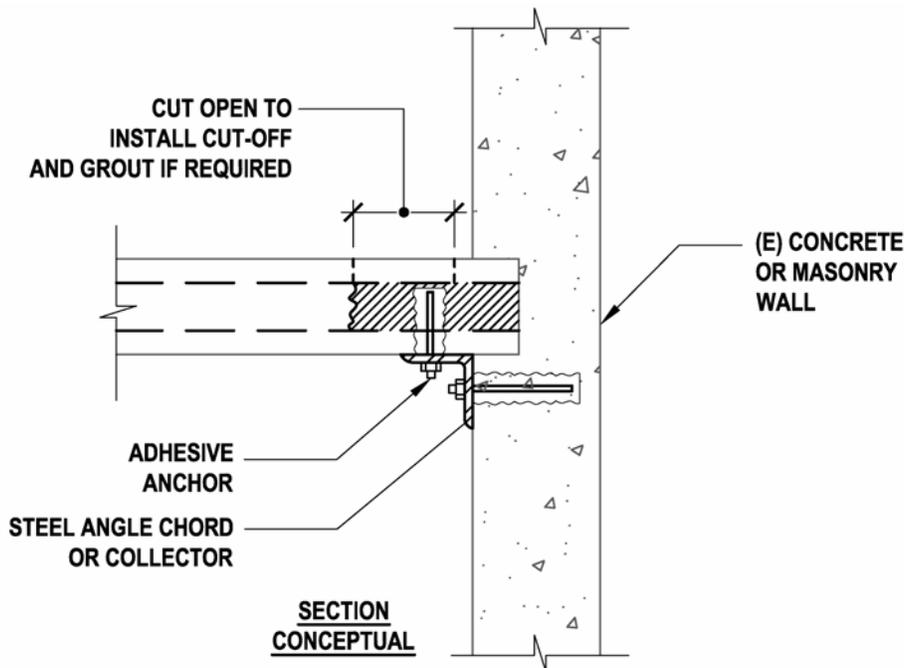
Steel Chord or Collector at Floor Perimeter without Cast-In-Place Topping
